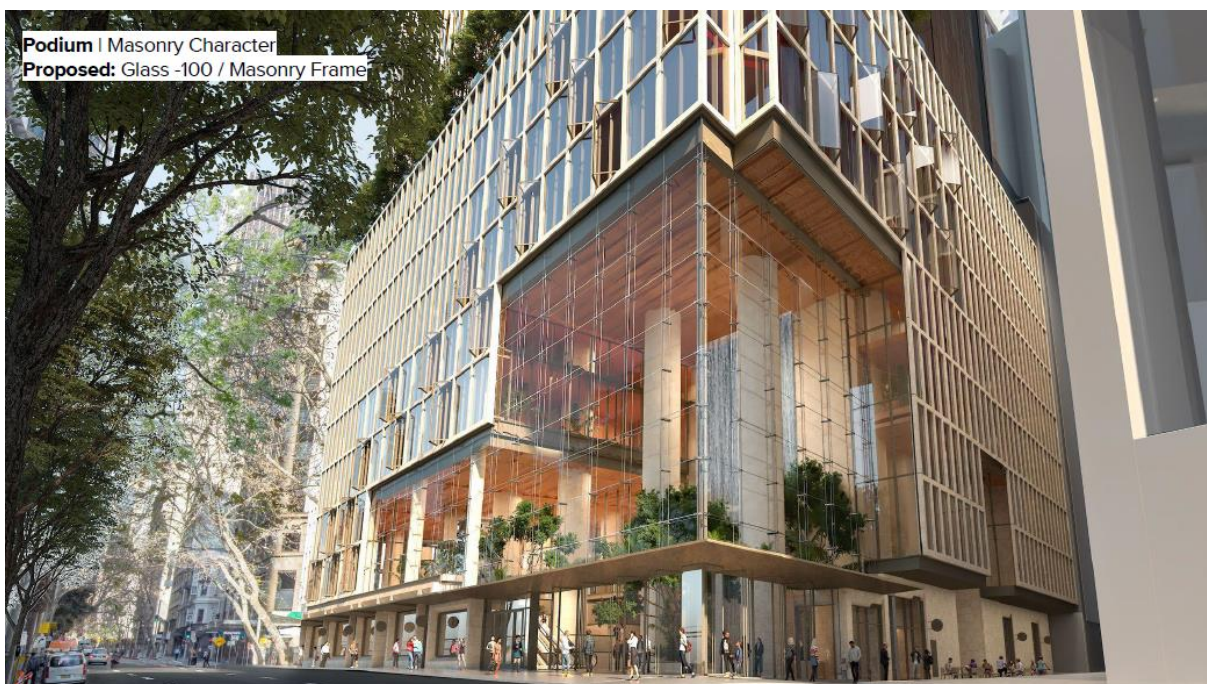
Photomontage of proposed podium - corner of Pitt Street and Underwood Street
